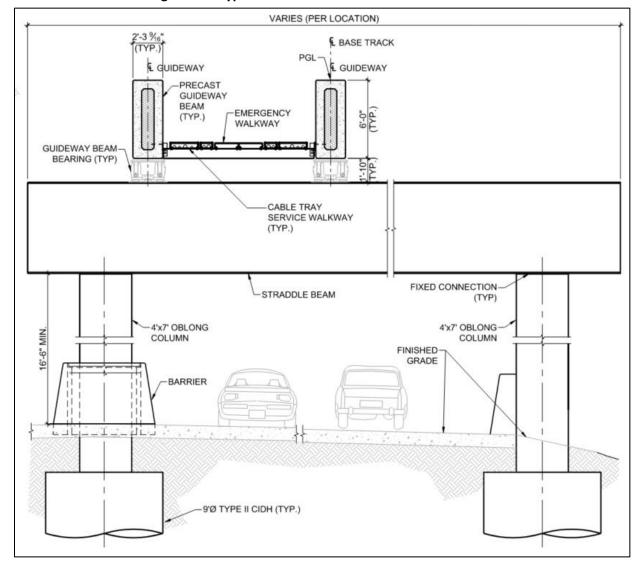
Typical Monorail Straddle-Bent Cross-Section
